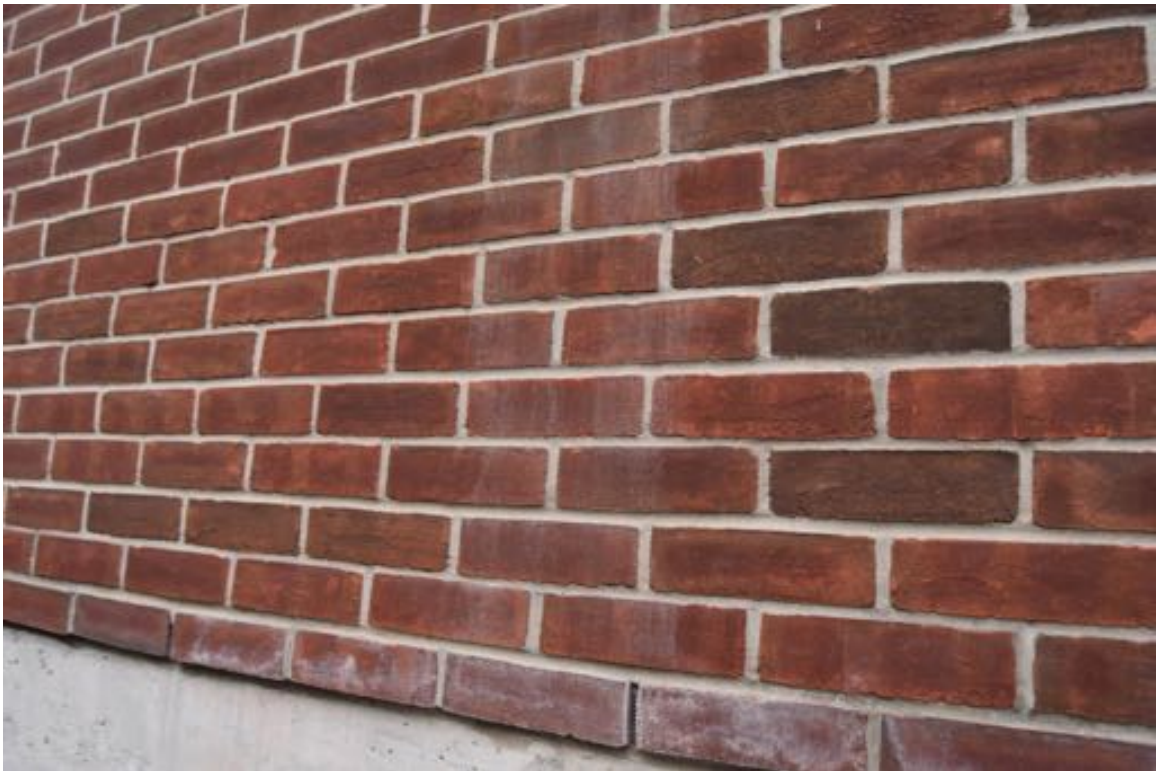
Southeast corner of the building, discoloration/staining visible on brick veneer under precast panels
